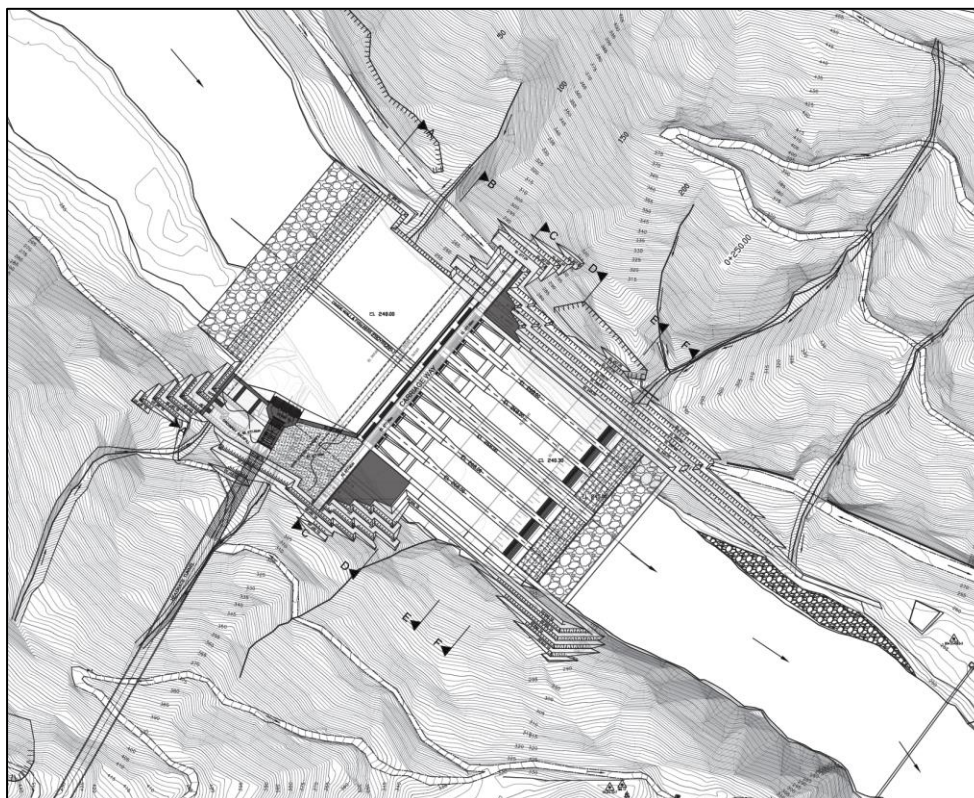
Layout of the barrage (Source: Detail Design Report, 2021)
